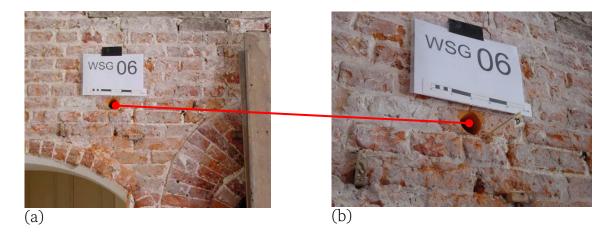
(a) section of north-facing interior wall of the west range adjacent to the kitchen fireplace in the basement showing location of WSG-06, (b) close-up of sampling location WSG-06 showing core hole and dosemeter (flag D)
